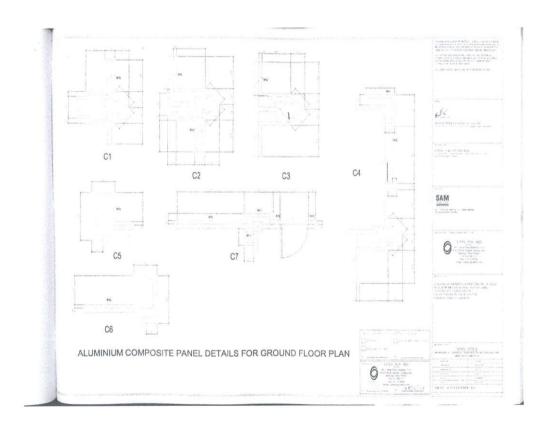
Aluminium composite panel detail for Ground Floor Plan.
